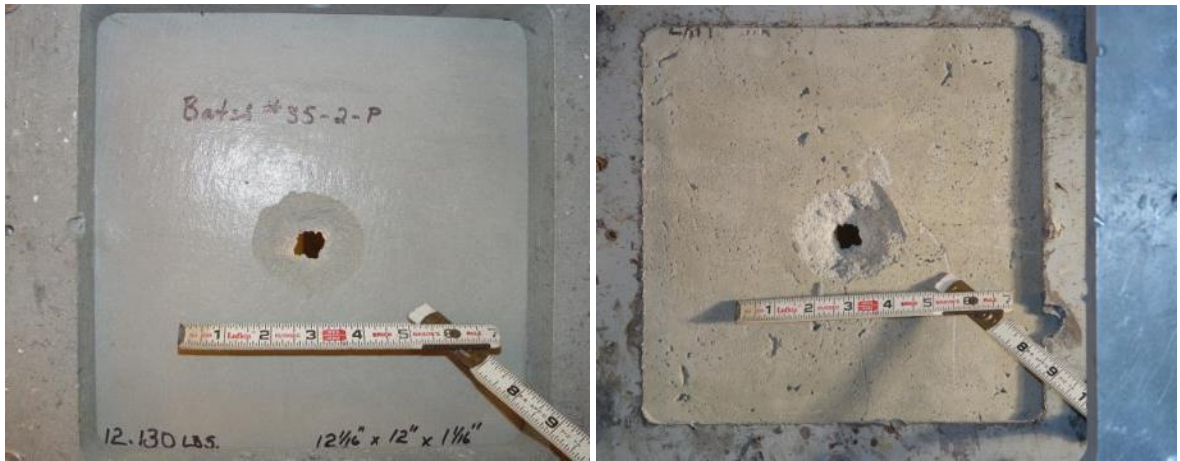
Target panel test setup (front side and exit side, after impact)
